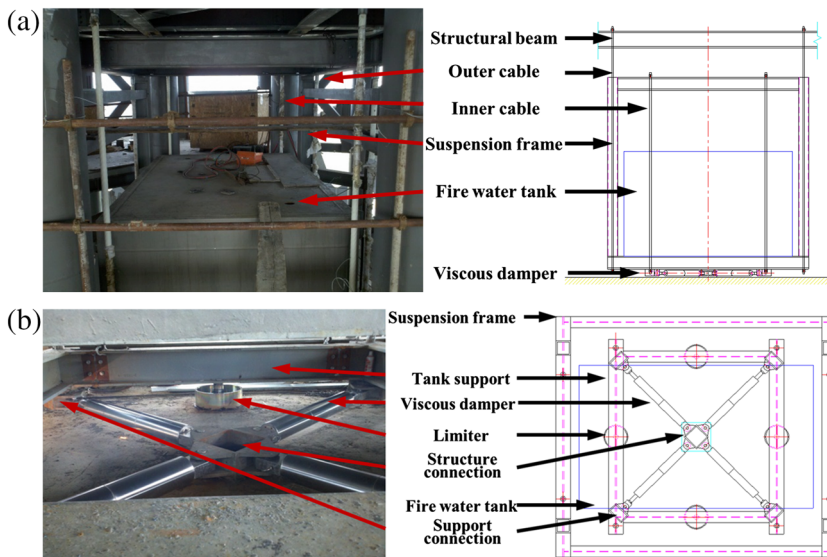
Configurations of the double-stage pendulum tuned mass damper (DPTMD): (a) Elevation view. Configurations of the DPTMD: (b) Plane view
